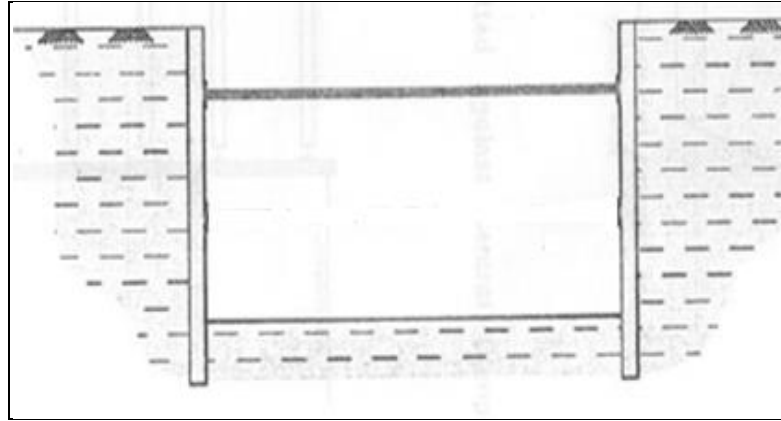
Schematic braced cantilever wall in narrow excavation [2]
